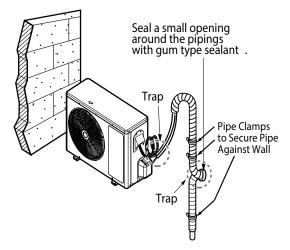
Piping/Trap when indoor unit is above outdoor unit
